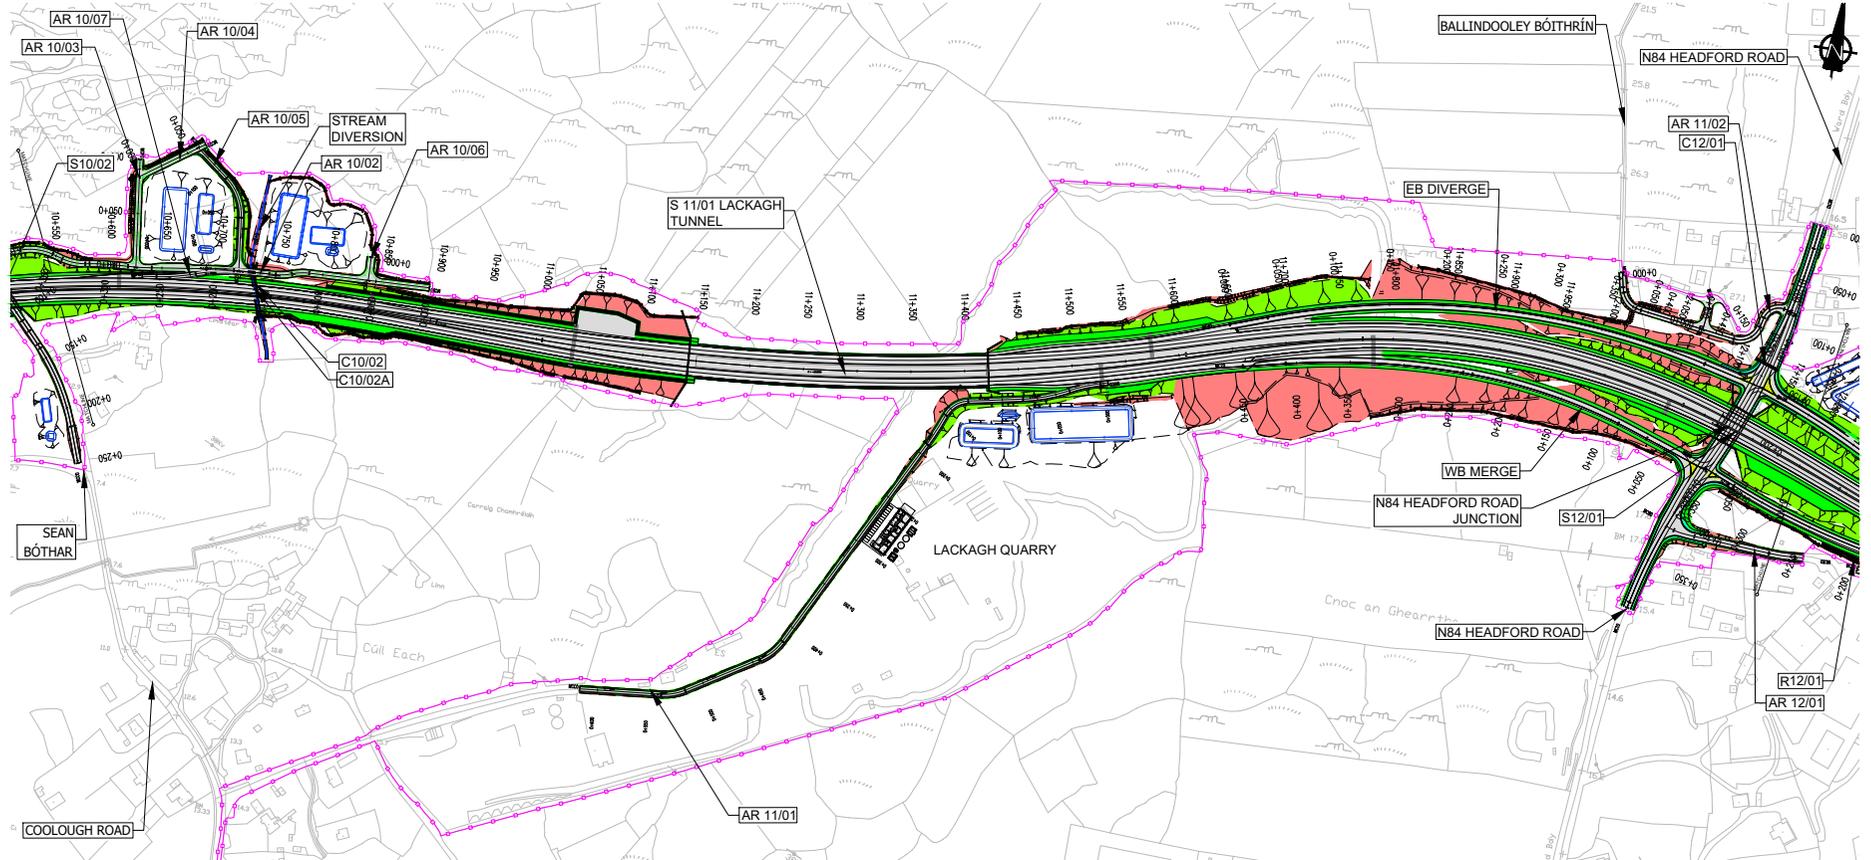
Plan layout of the proposed road development - 8 of 15
